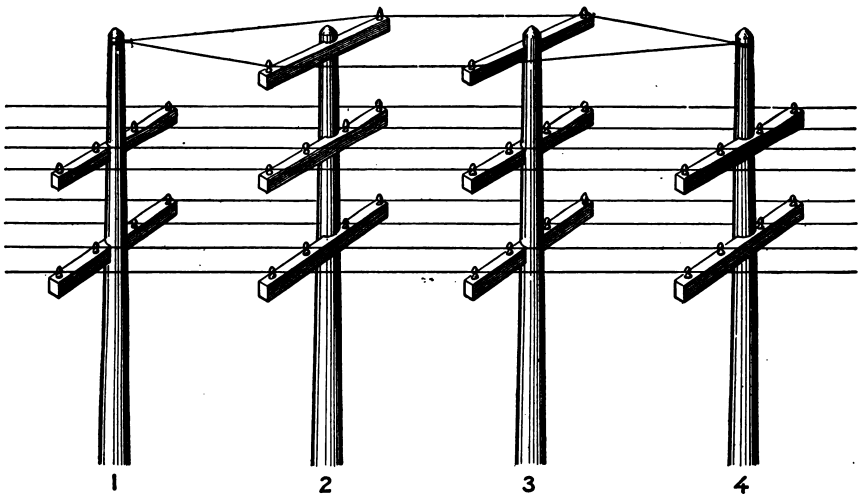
AERIAL LINE CONSTRUCTION, GUARD WIRES.
